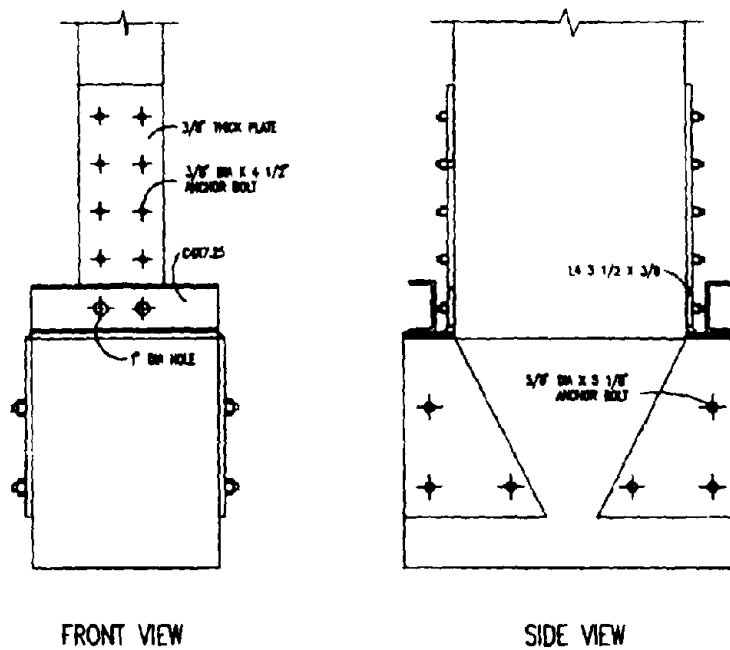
Column Repaired with Retrofit Steel Jacket.
